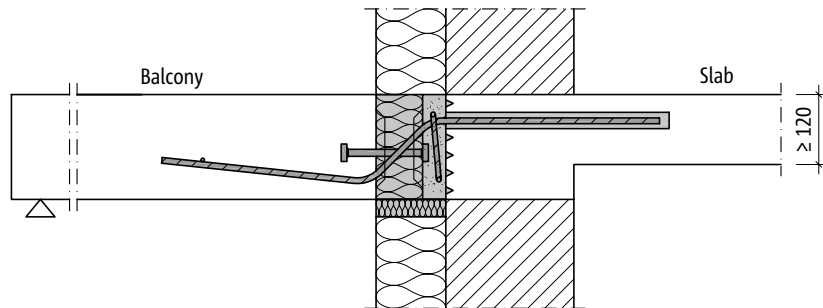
Connection with thermal insulation composite system (TCIS) and thin floor with type RQP
